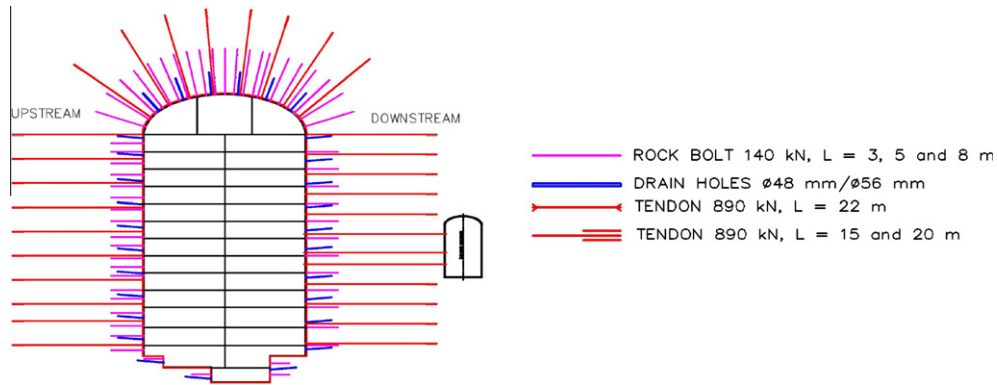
Typical support system installed in the powerhouse cavern and excavation stages with drainage holes at roof and sidewalls.
